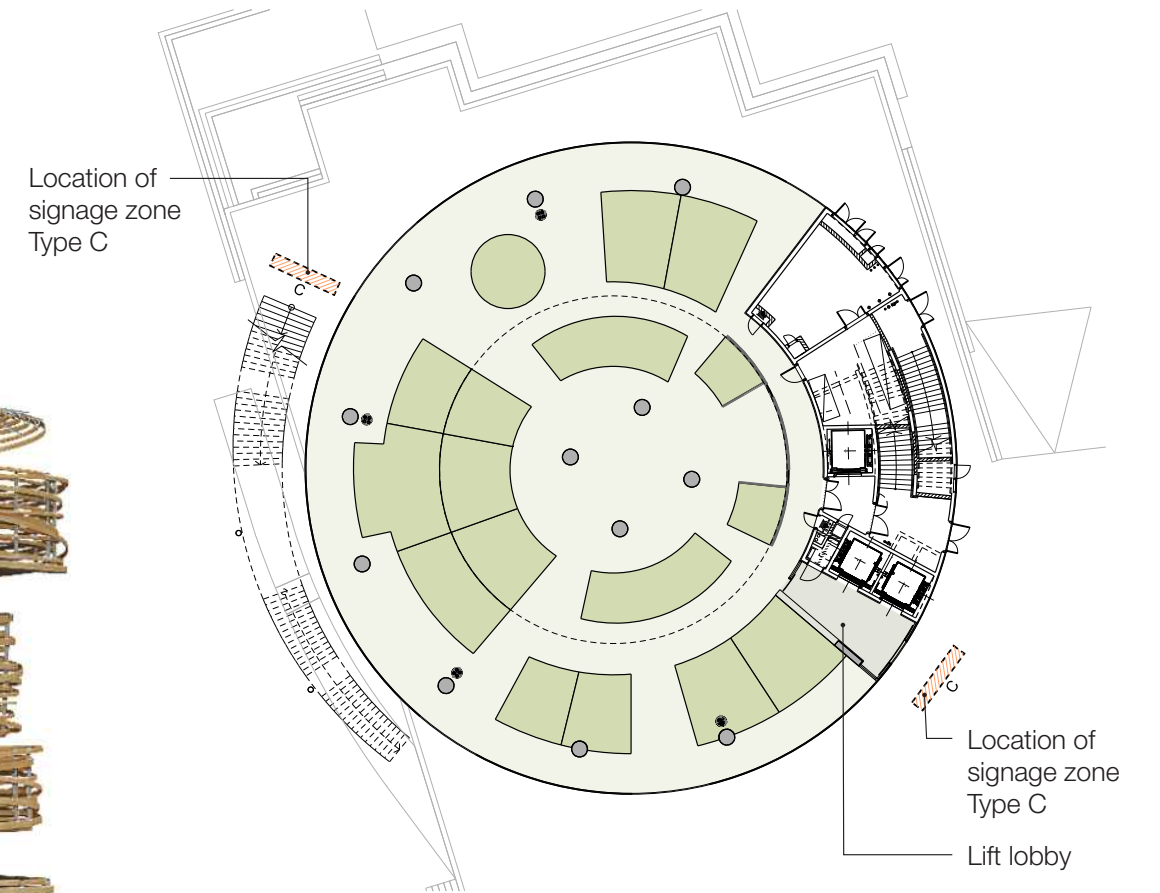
Ground floor plan with Indicative signage zone Type C
